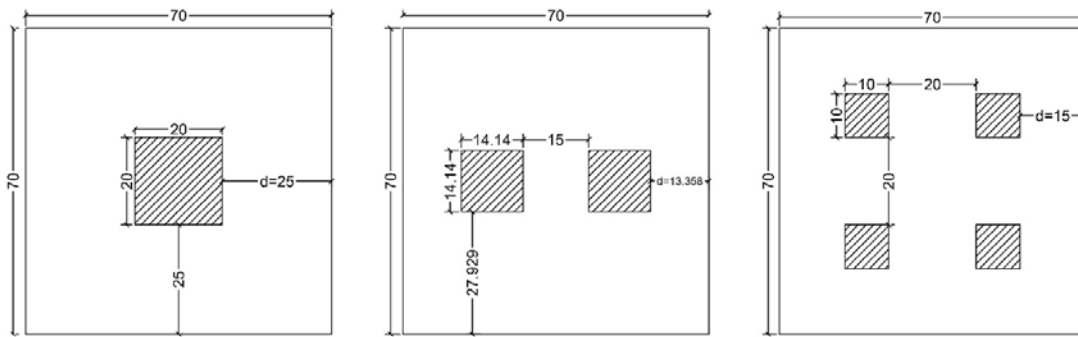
plan of single, twin and quadruple atrium building with different distances to the external wall: first group of simulations
